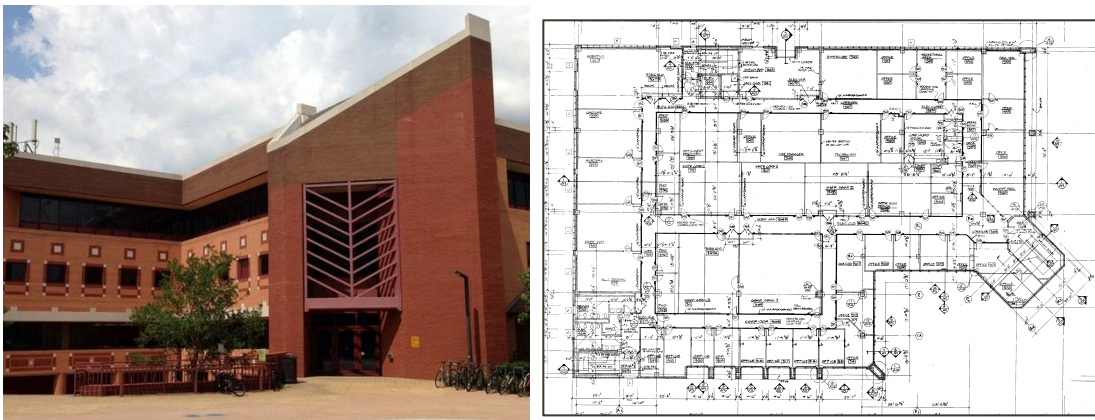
Elevation and typical floor plan of the fourth case building: COC
